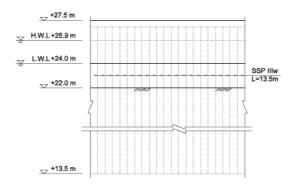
Structural Drawings of Log Yard Berth
